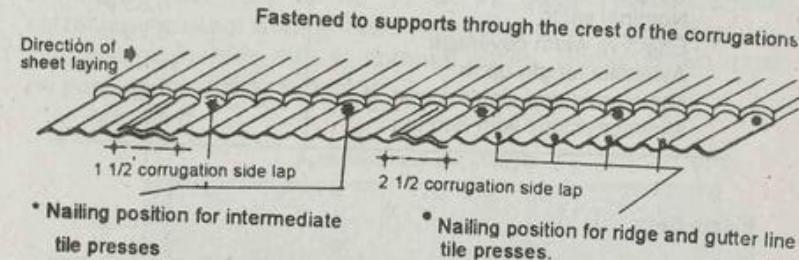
MILANO LONG SPAN STEEL BRICKS
